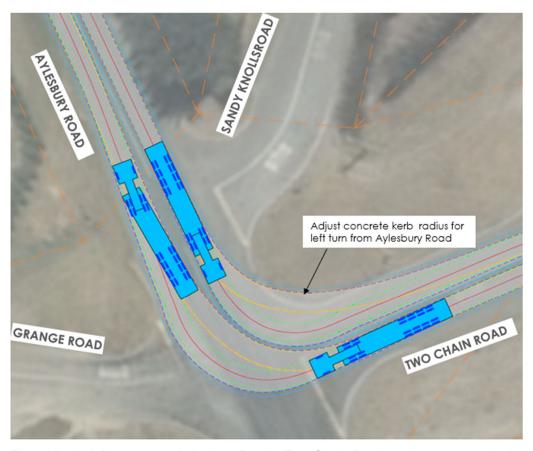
Adjustment to Aylesbury Road - Two Chain Road northeast corner kerb
